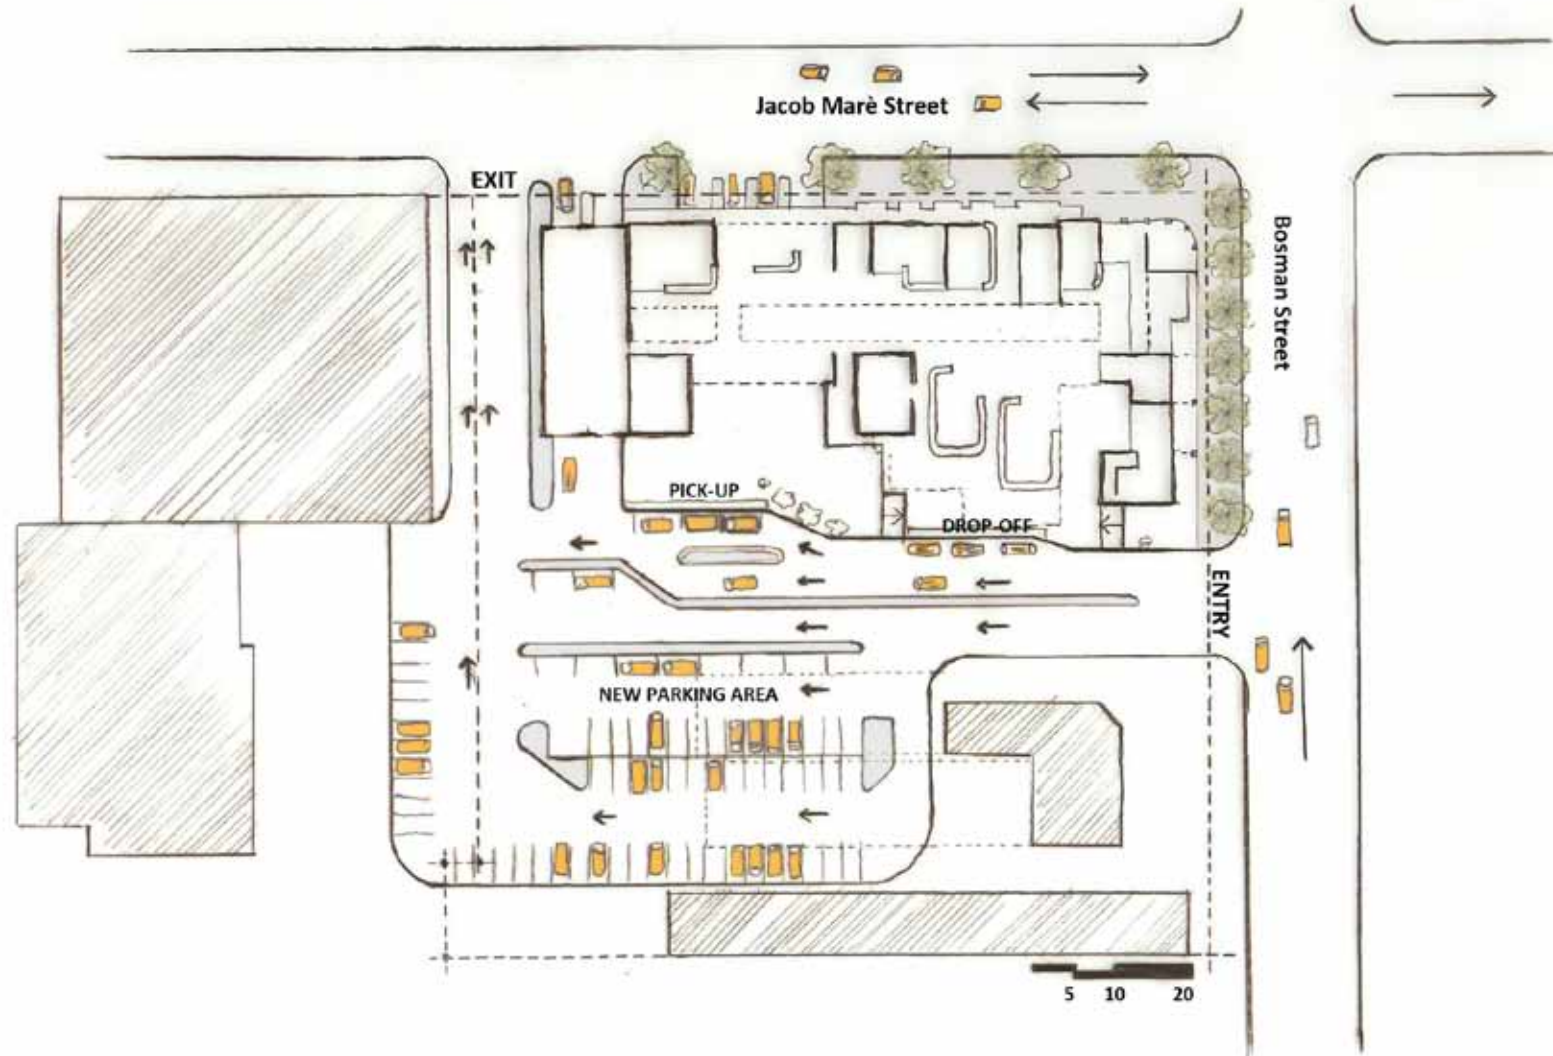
SITE PLAN_Proposed redeveloped site plan
